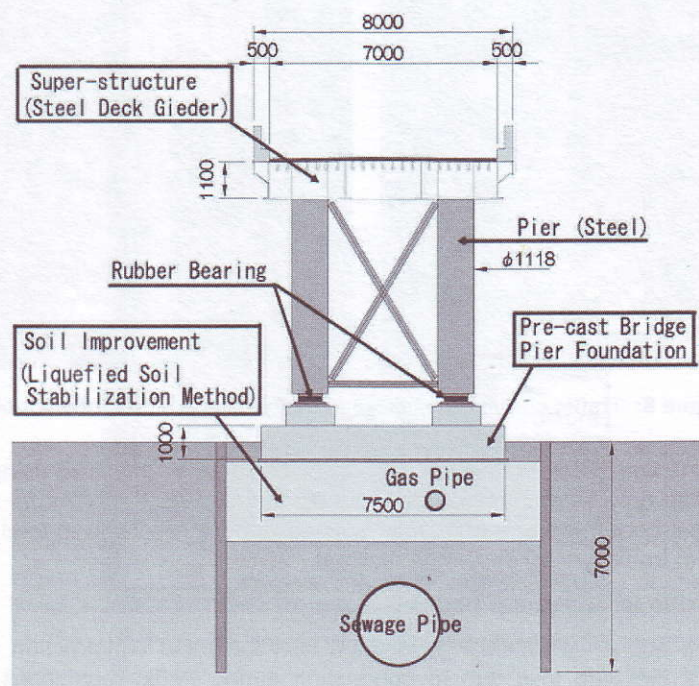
Cross-section of Chofu-Tsurukawa over-bridge
